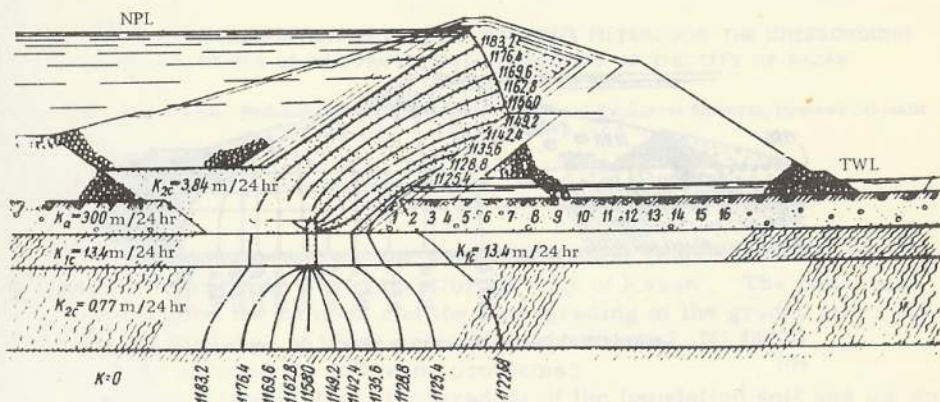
Equipotential lines in the cross section of the rock-fill portion of a dam
